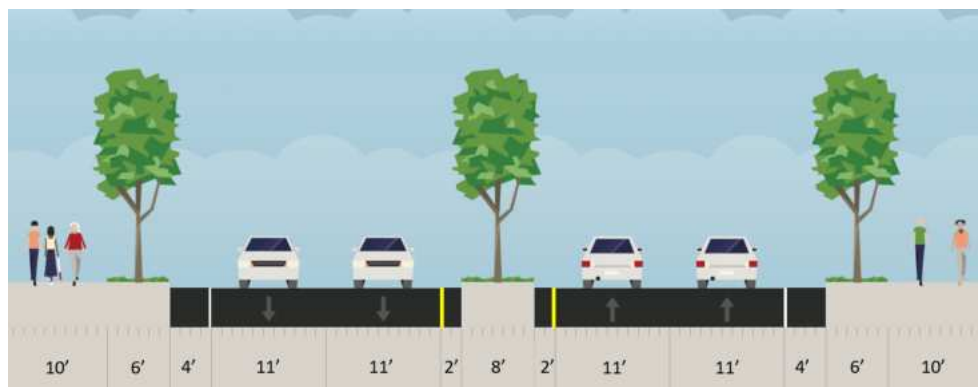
Proposed Roadway Typical Section between the Connecticut College Main Entrance and Deshon Street
